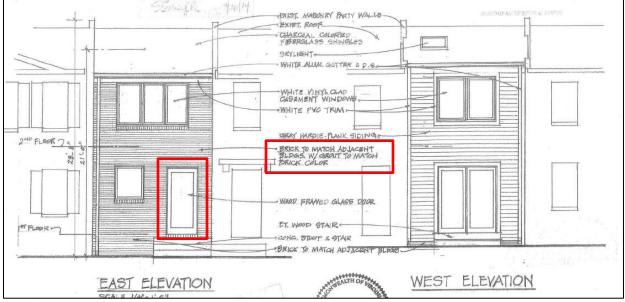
Approved building permit elevations (BLD2015-0346, 4/8/15); not constructed
